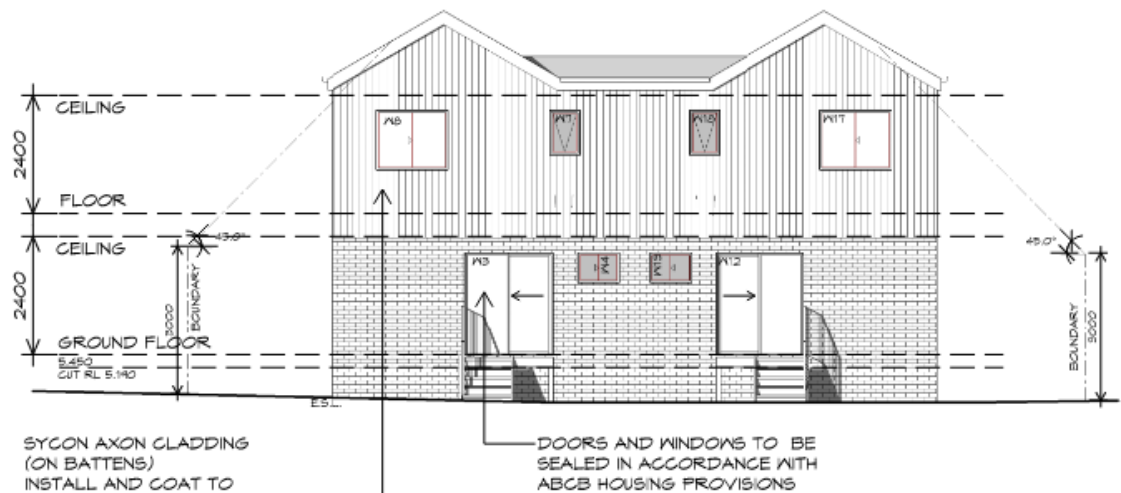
Building Envelope Units 1A and 1B (drawing PD23116-J-04, revision 04) (source: Application documents)
